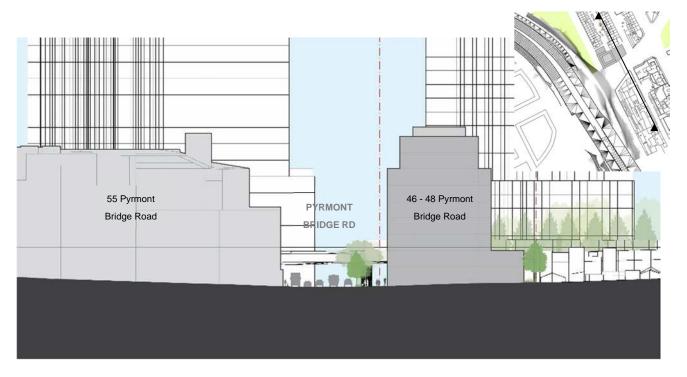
section of 46-48 Pyrmont Bridge Road, looking west; showing alternative controls for commercial development (exhibited late 2024)
